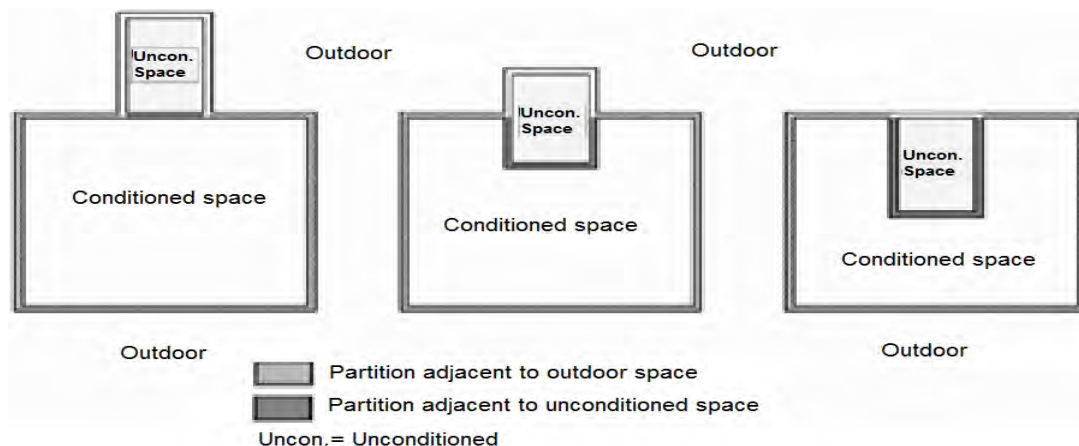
The status of the partitions adjacent to outside and unconditioned space in schematic plan of 3 sample buildings
